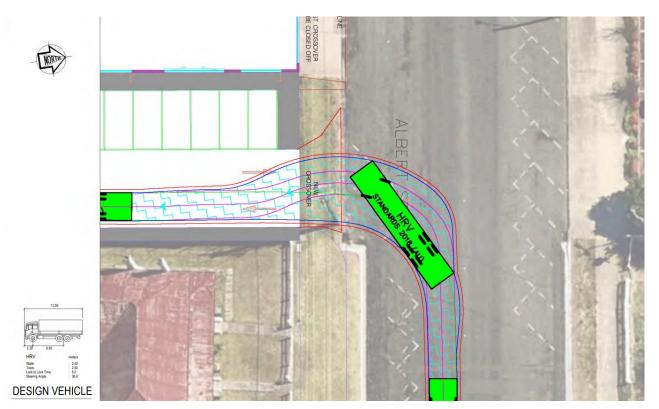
Albert Street Crossover - HRV Ingress Manoeuvre
